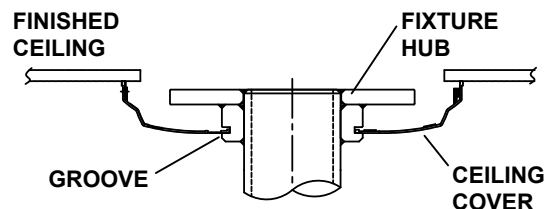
AUT\_H Ceiling Cover Installation (Standard Ceiling)
